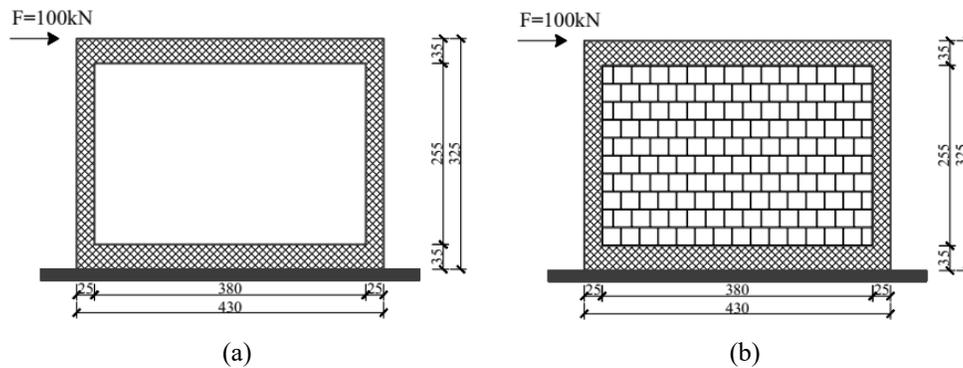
The geometry of examined structure: a) bare frame b) infilled frame
